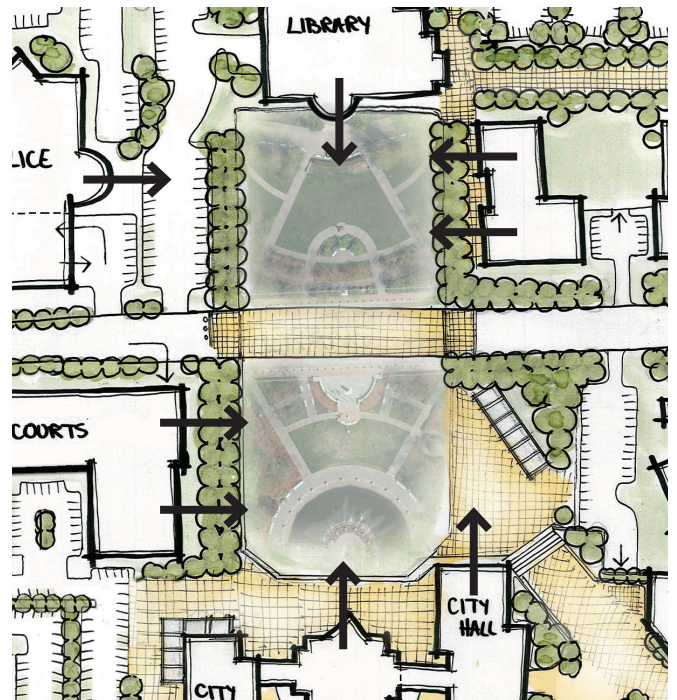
Buildings should be designed and oriented to encourage casual surveillance and “eyes on the street”
